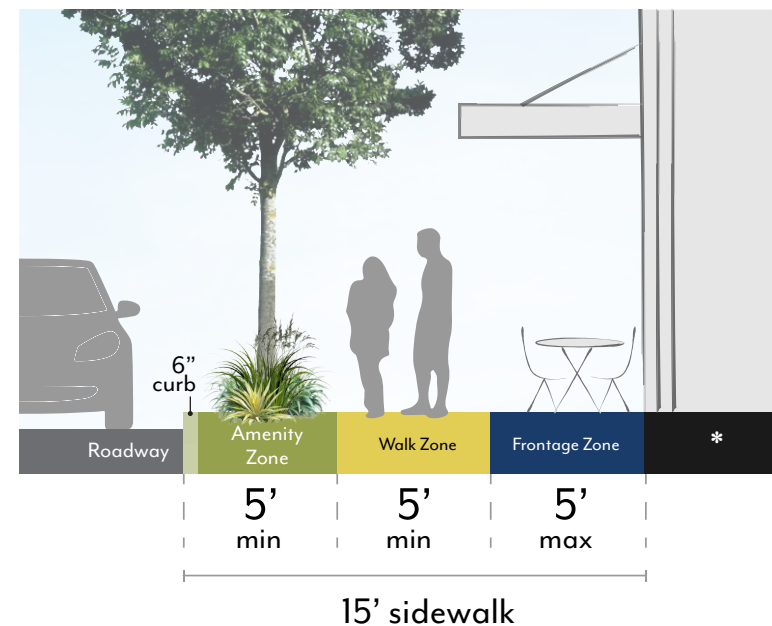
Required Sidewalk Width - Colorado Blvd.
